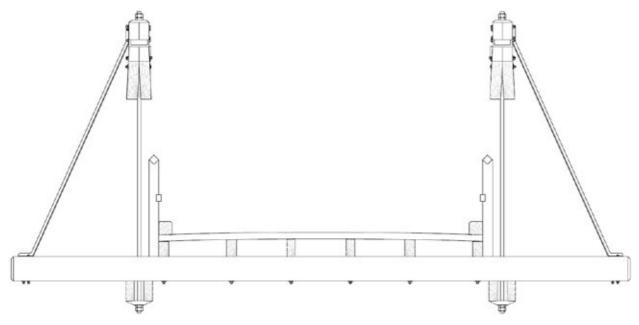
Original design of Allan truss top and bottom cast iron shoes
